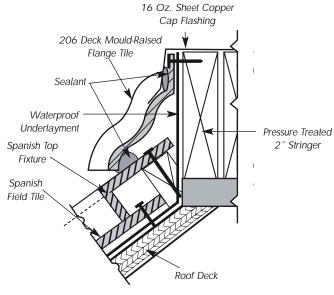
Deck Section Showing 206 Cut-Off Ridge
